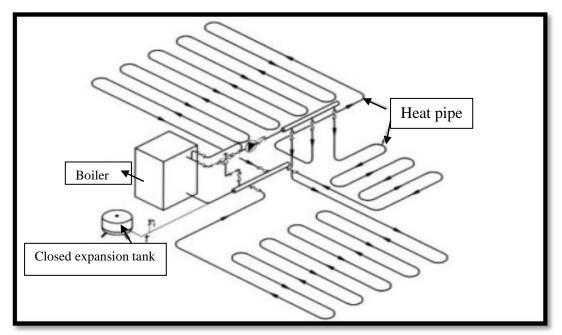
Underfloor Heatin System Application (Arıcı, 2010)
